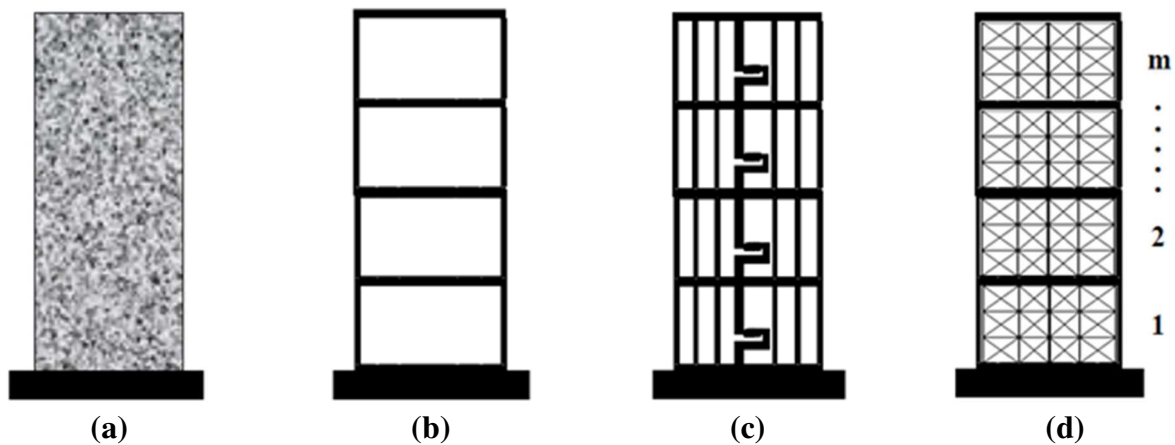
Overview of available macro modelling approaches: a) A typical RC shear wall, b) Wide column model (Millard, 1993), c) Multiple vertical line element model (Vulcano et al., 1988), and d) Truss model (Panagiotou and Restrepo, 2011)
